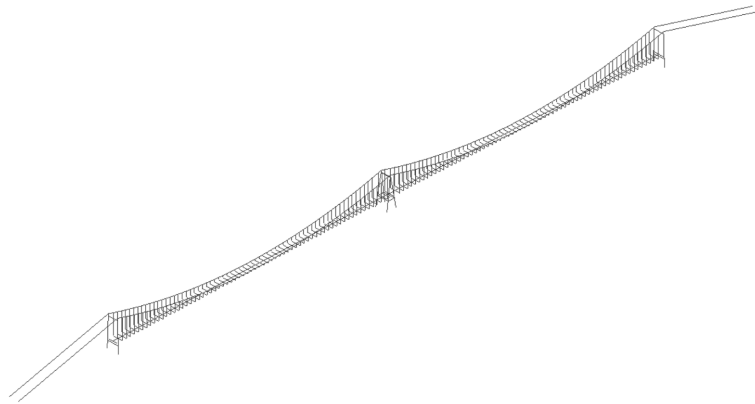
3D finite element model of the case bridge with a concrete longitudinal A-shaped center tower
